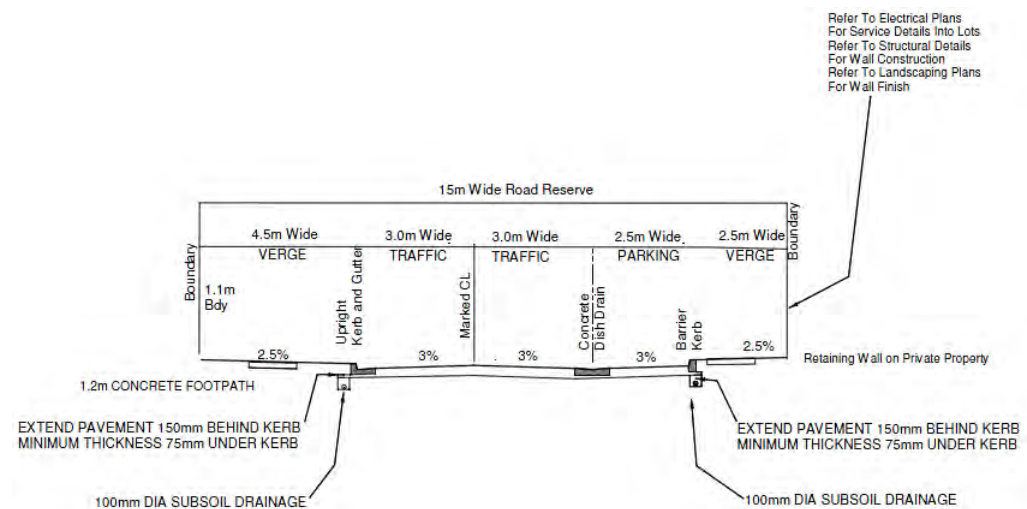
TYPICAL CROSS SECTION ROAD 6 WITH PARKING BAYS
